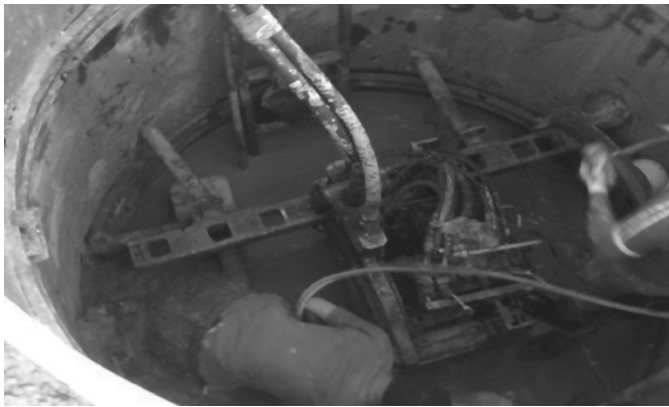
Execution of wastewater network by pipe jacking. Deilam wastewater plan (with permission of NWWEC).
